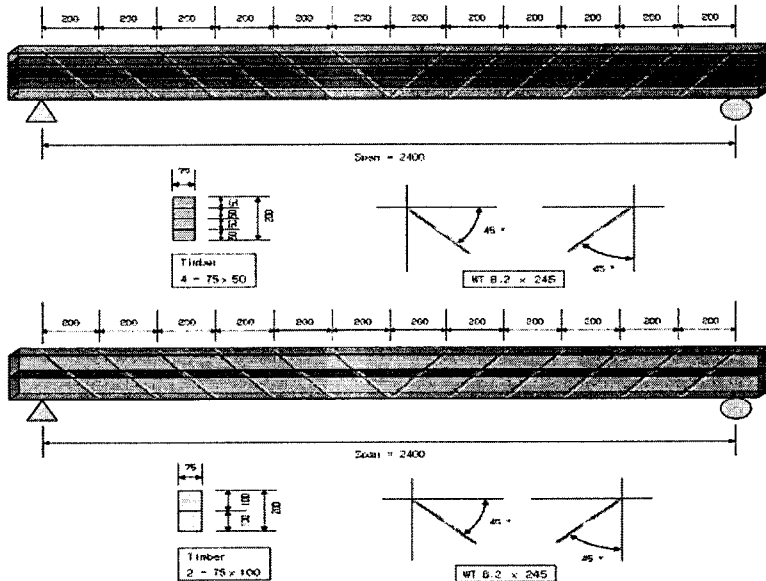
Two types of Built-up beam manufactured with steel lag bolts.
